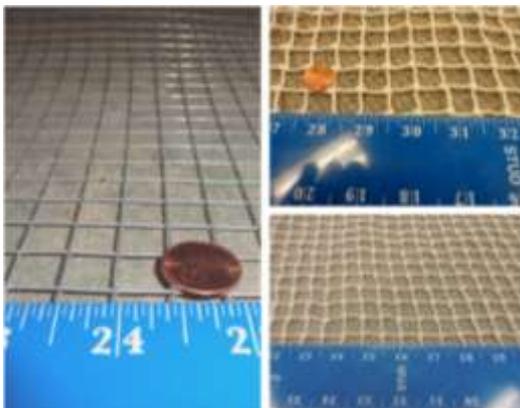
Welded wire steel (left) and #21 FN mesh (right) spacing [28].
